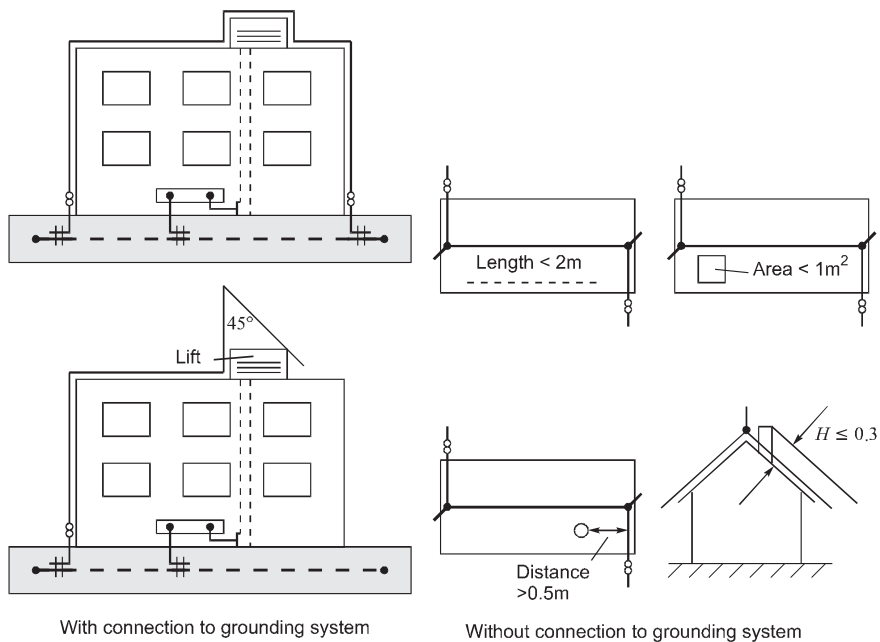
Air terminal – roof superstructures of electrically conductive material [79]
